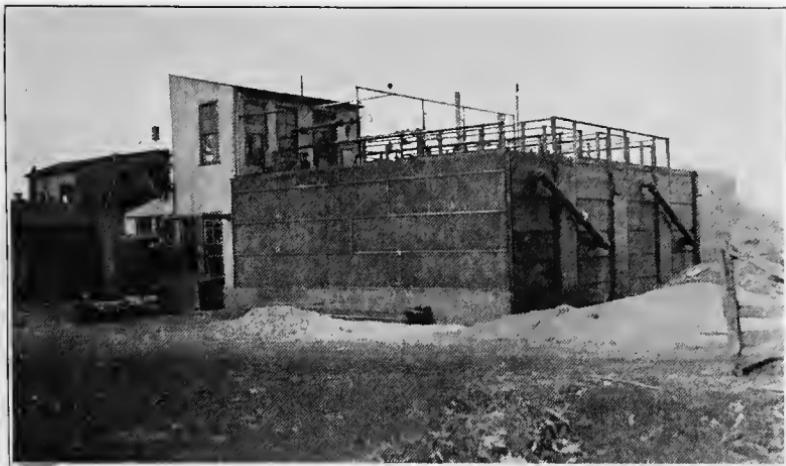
Center Ave. Testing Station from West, Showing Activated Sludge Plant.
